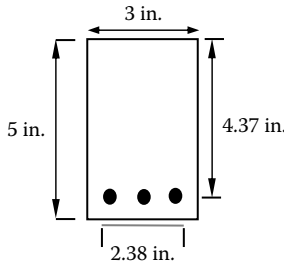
Example 5.10 showing the section and FRP design details.
